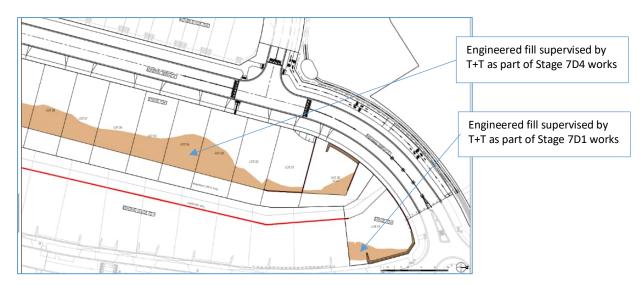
Extract from CJ Arms drawing titled 'Fill Layout Plan', Project No.15006, Drawing No.9900, Sheet 1
